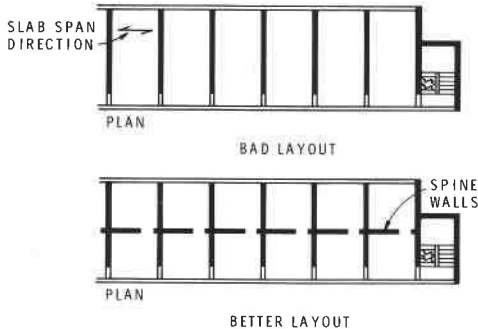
Use of spine walls (only load-bearing walls (heavy lines) and exterior cladding are shown).
